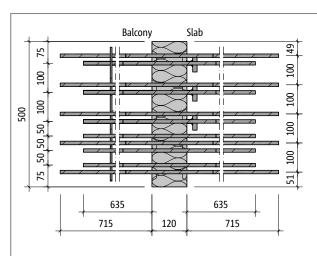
Schöck Isokorb[®] XT type C-R-M2-V2: Product plan view
